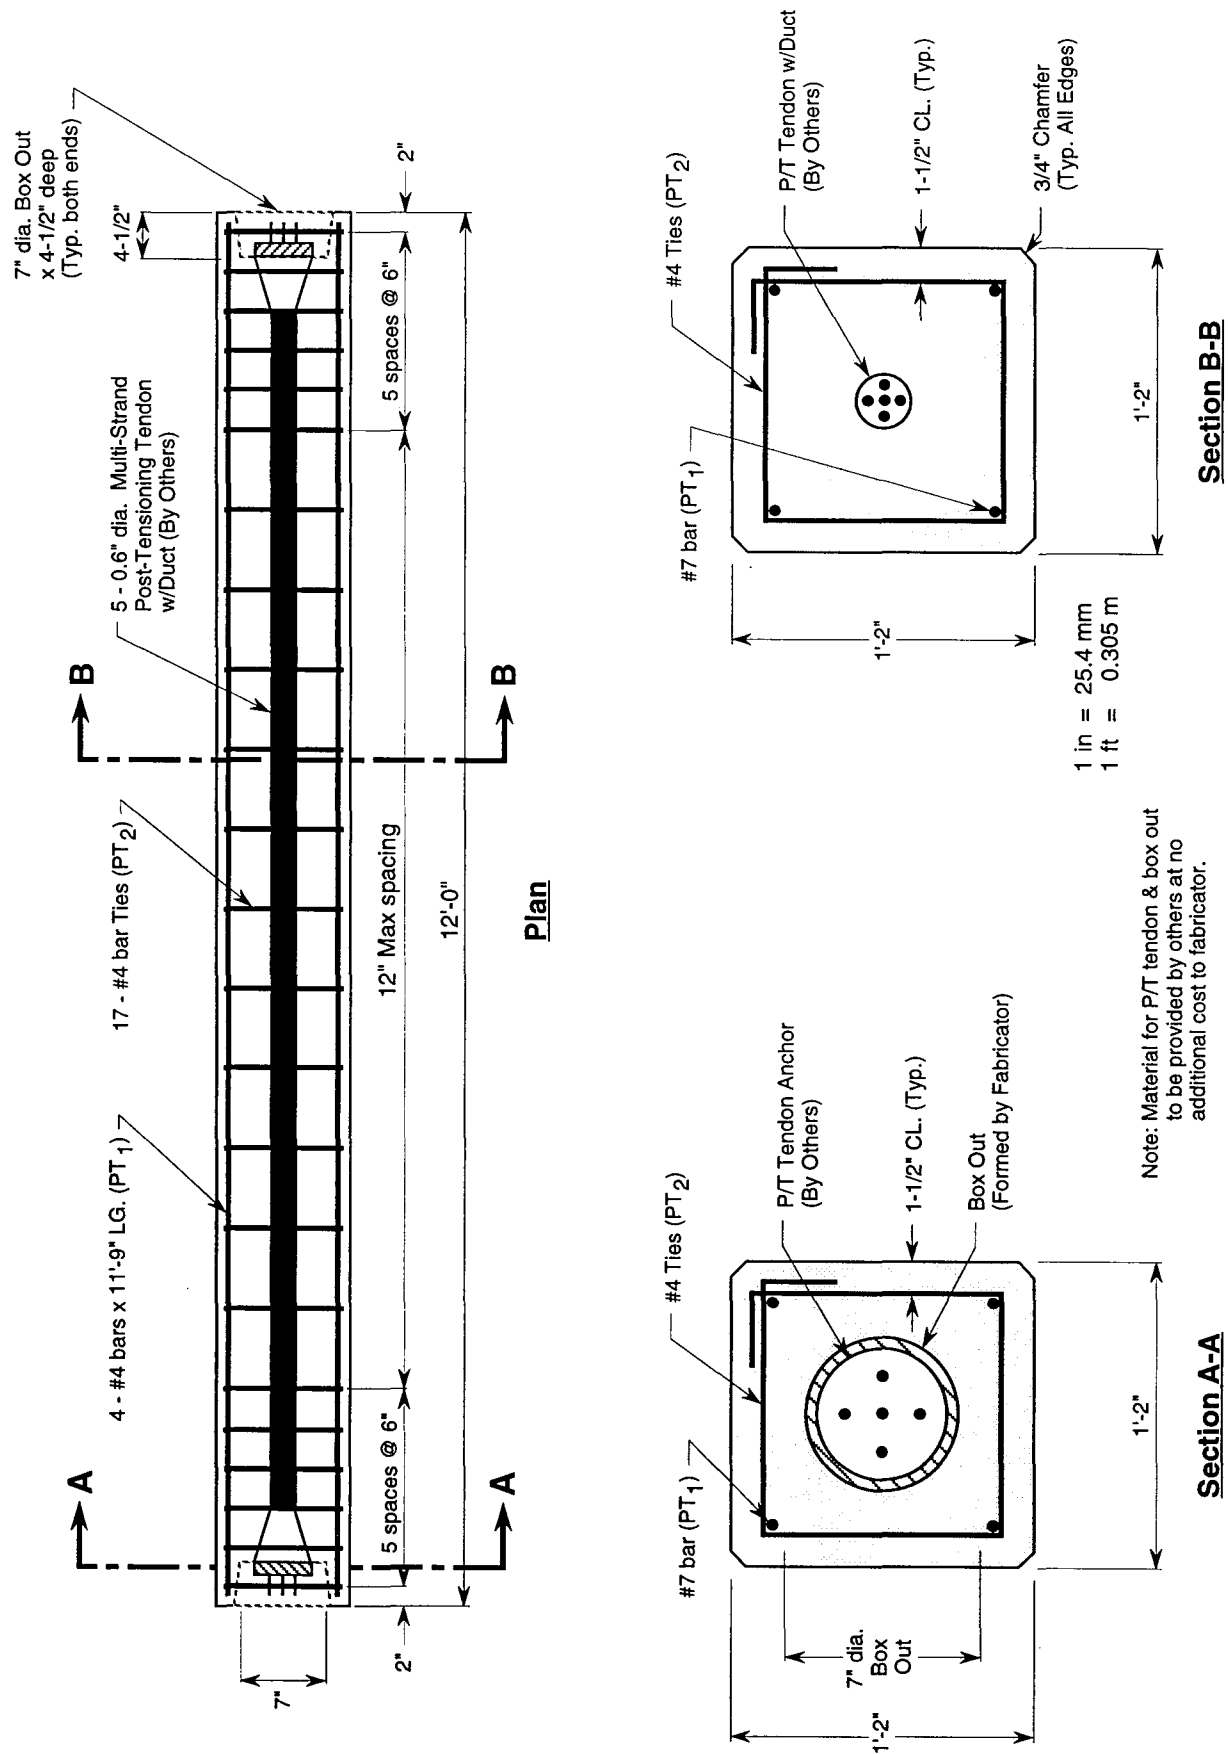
Design details for multi-strand post-tensioned concrete beam specimens.
